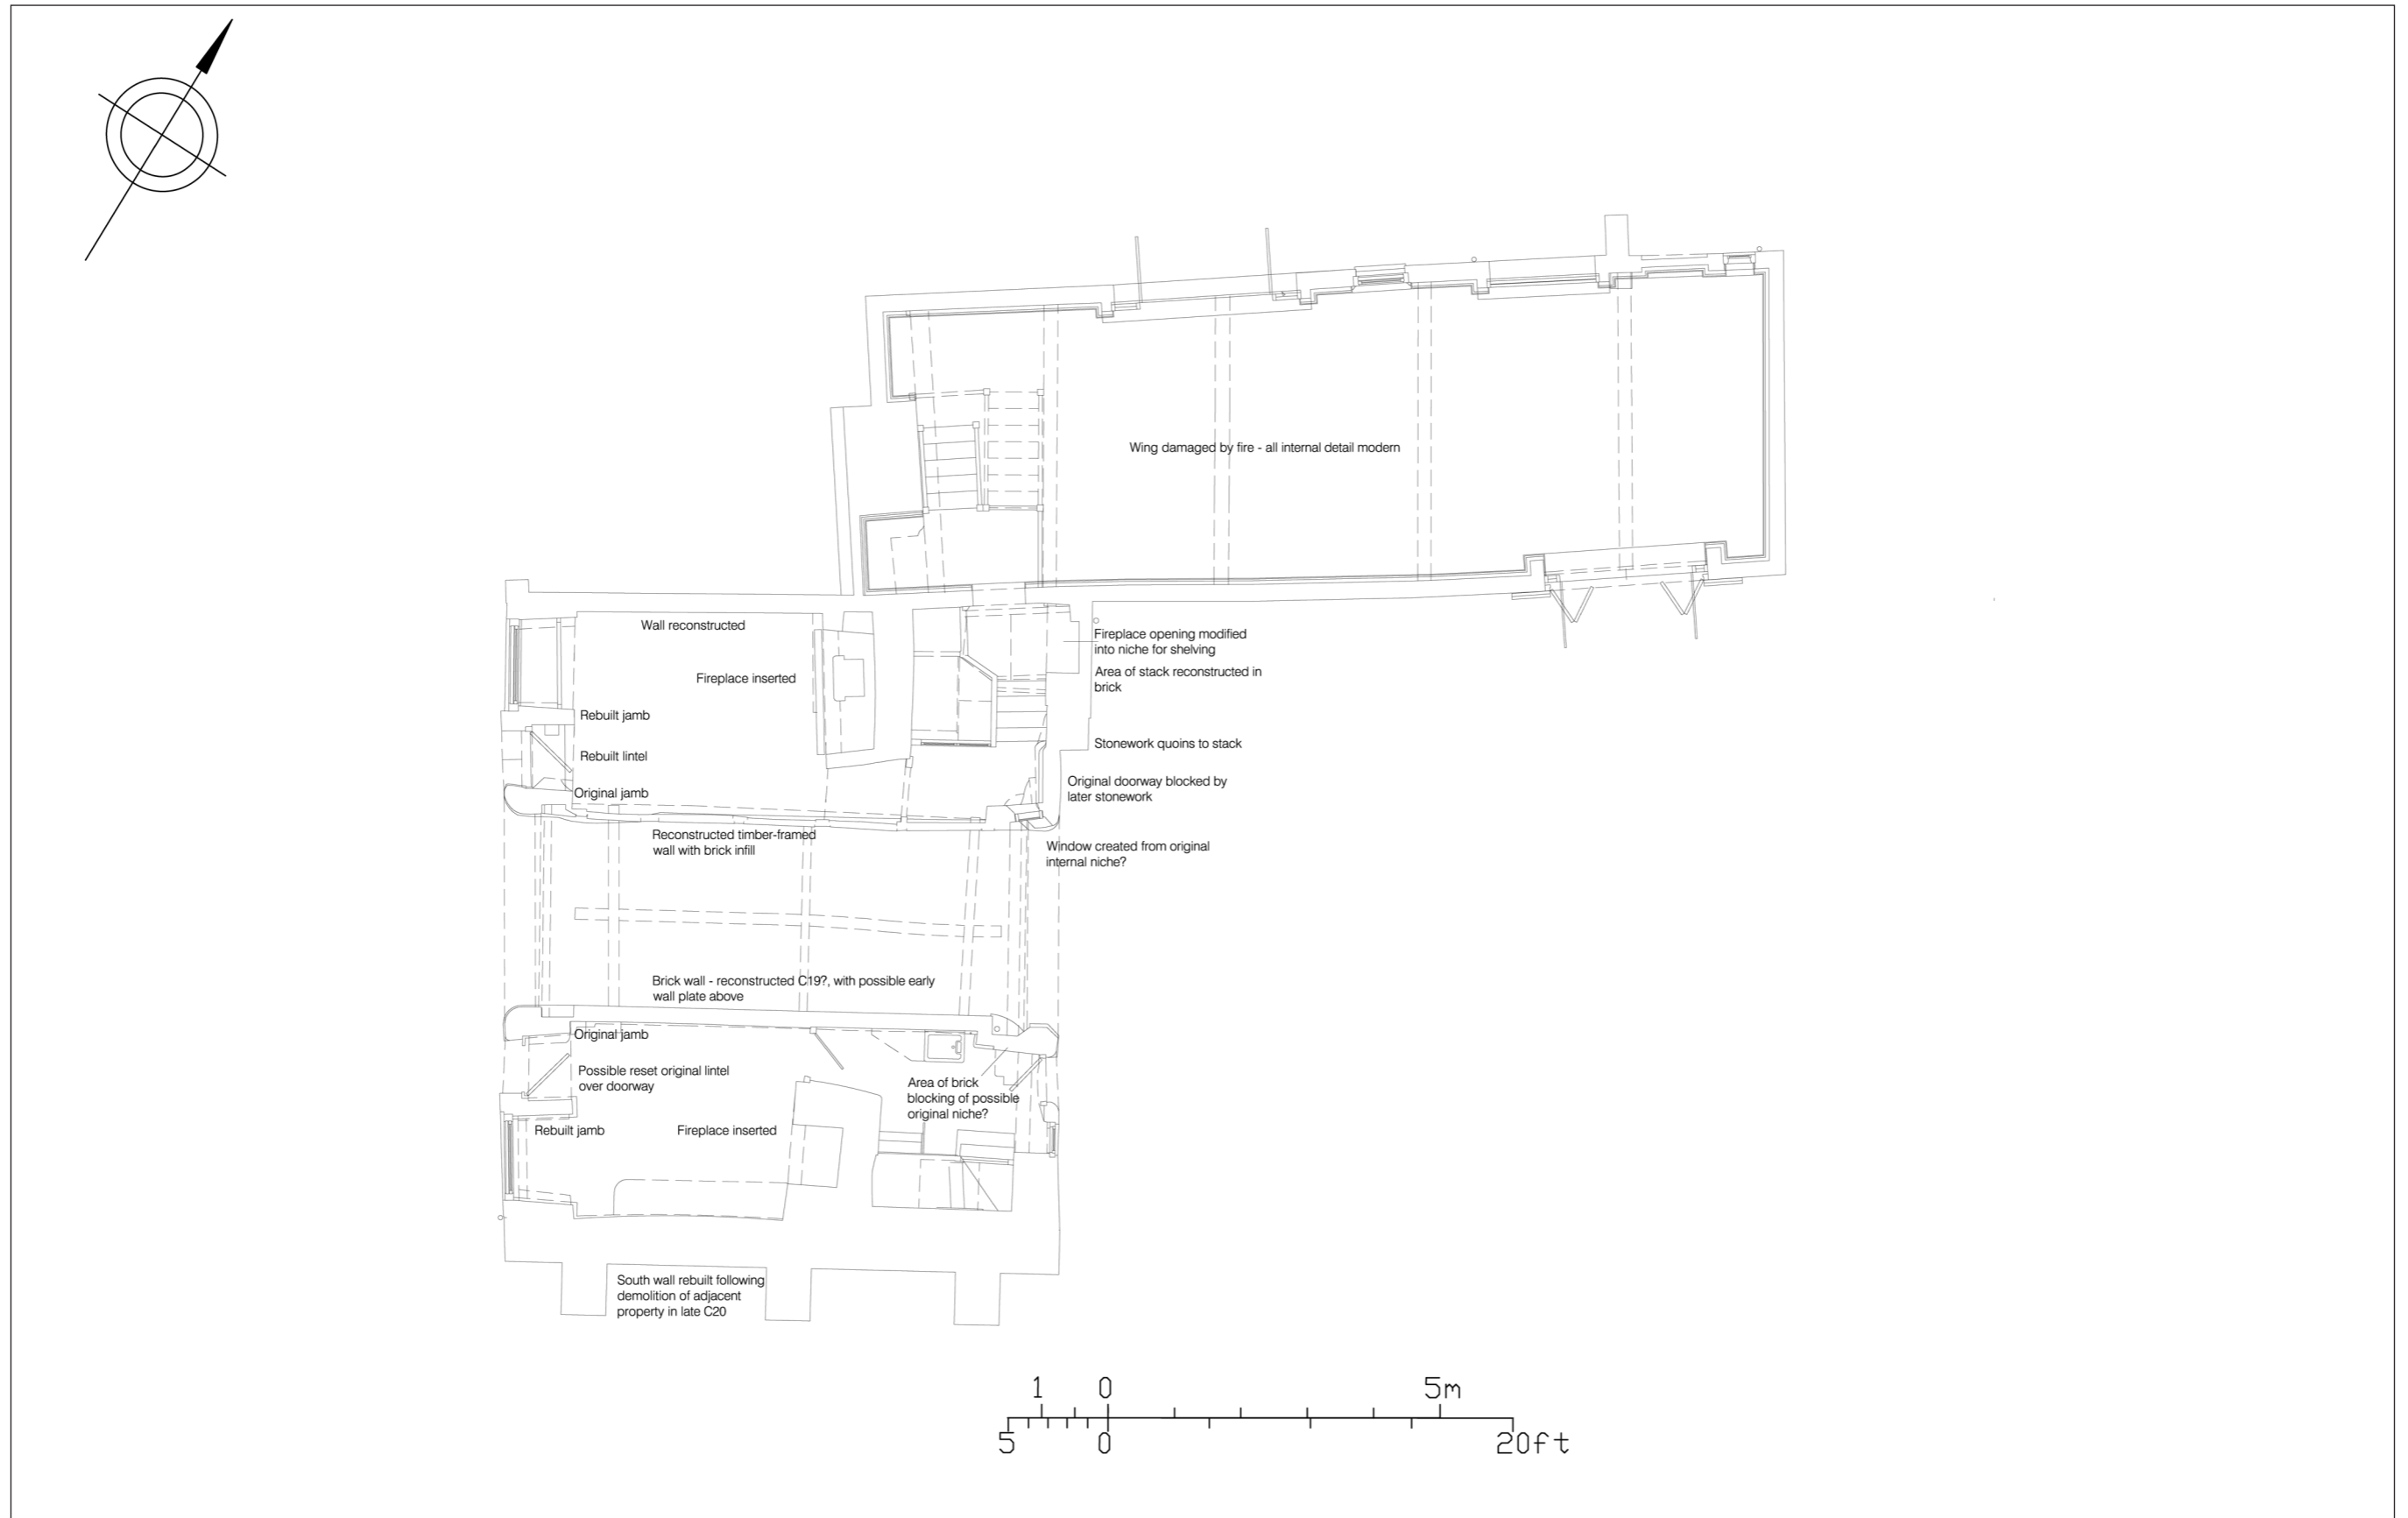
Ground-floor plan. Scale 1:100. [Based on survey drawings from Acanthus Clews Architects © Coventry City Council]
